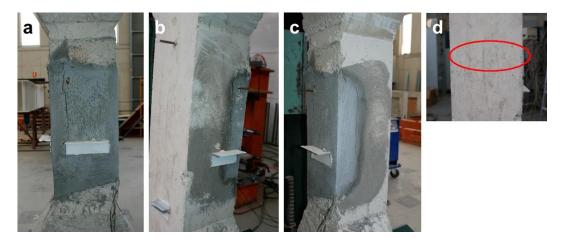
Column failure: Specimen P3B (repaired column with R3-mortar and BA): A) Side 1; b) Side 2; c) Side 4; d)
